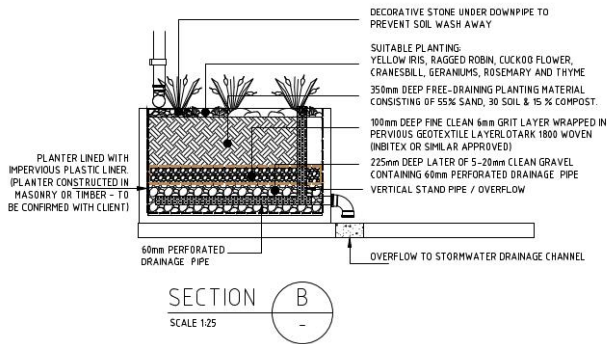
IMAGE EXAMPLE OF RAIN GARDEN PLANTER BOX DETAIL
